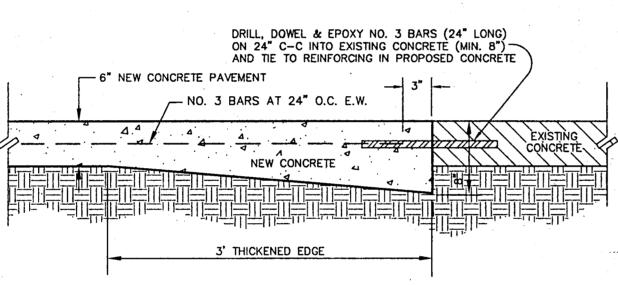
DETAIL OF PAVEMENT JOINT AT CURB NOT TO SCALE
